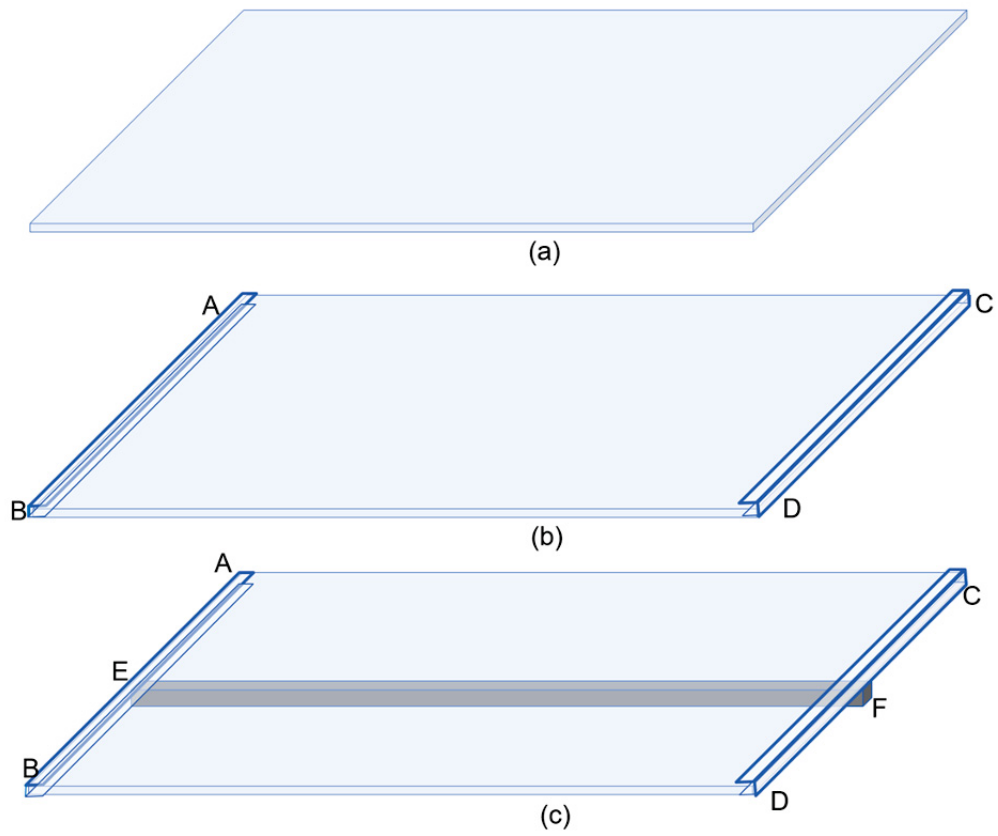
The layout of the mounting fixture for a BIPV module. (a) a laminated BIPV module; (b) install two end clamps AB and CD with pressure-glue connection or bolted connection, and; (c) install a mid-column EF for support and pretension of the module.
